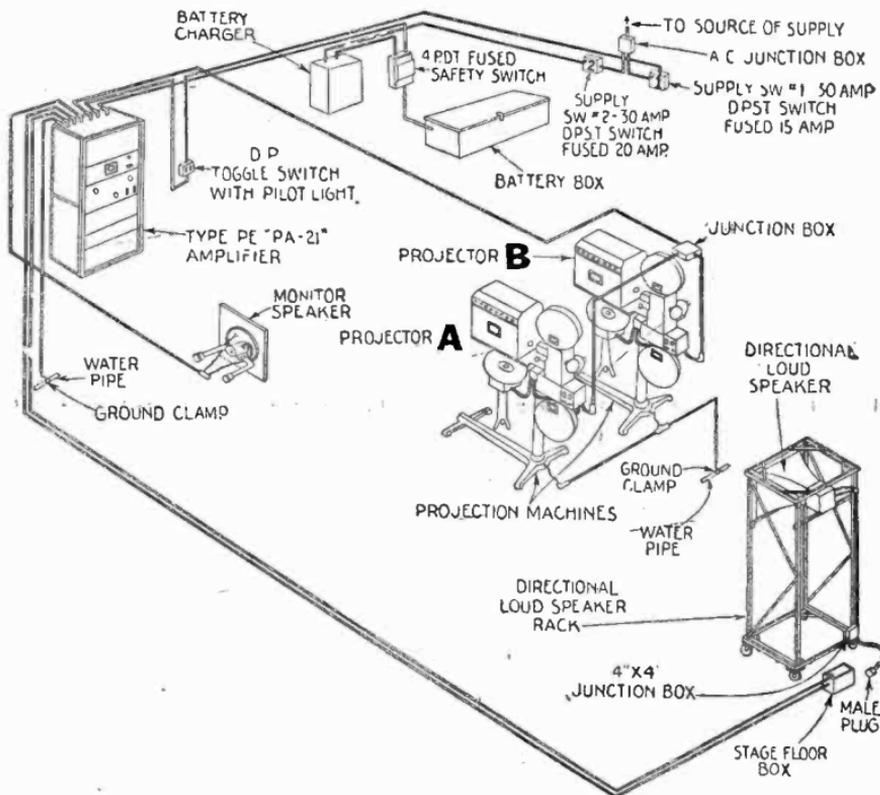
,952.—General layout of a typical RCA type PG-10 installation showing inter-apparatus run for directional loud speaker type installation. Exact location of RCA equipment to be determined by installation man; the directional loud speaker is to be mounted on rack so as to have the widest flare of the baffle in a horizontal and *not* in a vertical plane; stage floor box to be used on portable loud speaker rack installations only.
